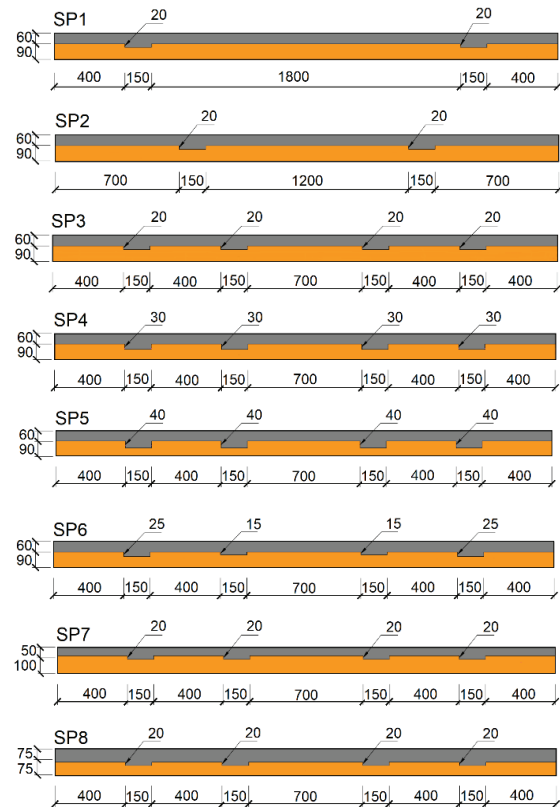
Nail-laminated timber-concrete composite beam configurations (dimensions in mm)
